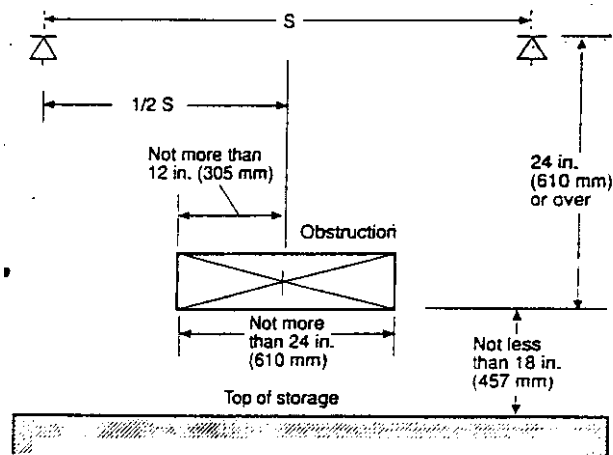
Position of sprinklers in relation to obstructions located 24 in. (610 mm) or more below deflectors.
